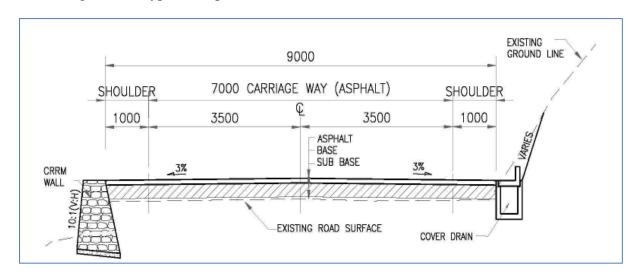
Typical Proposed Cross-section from Km 16 to 36
